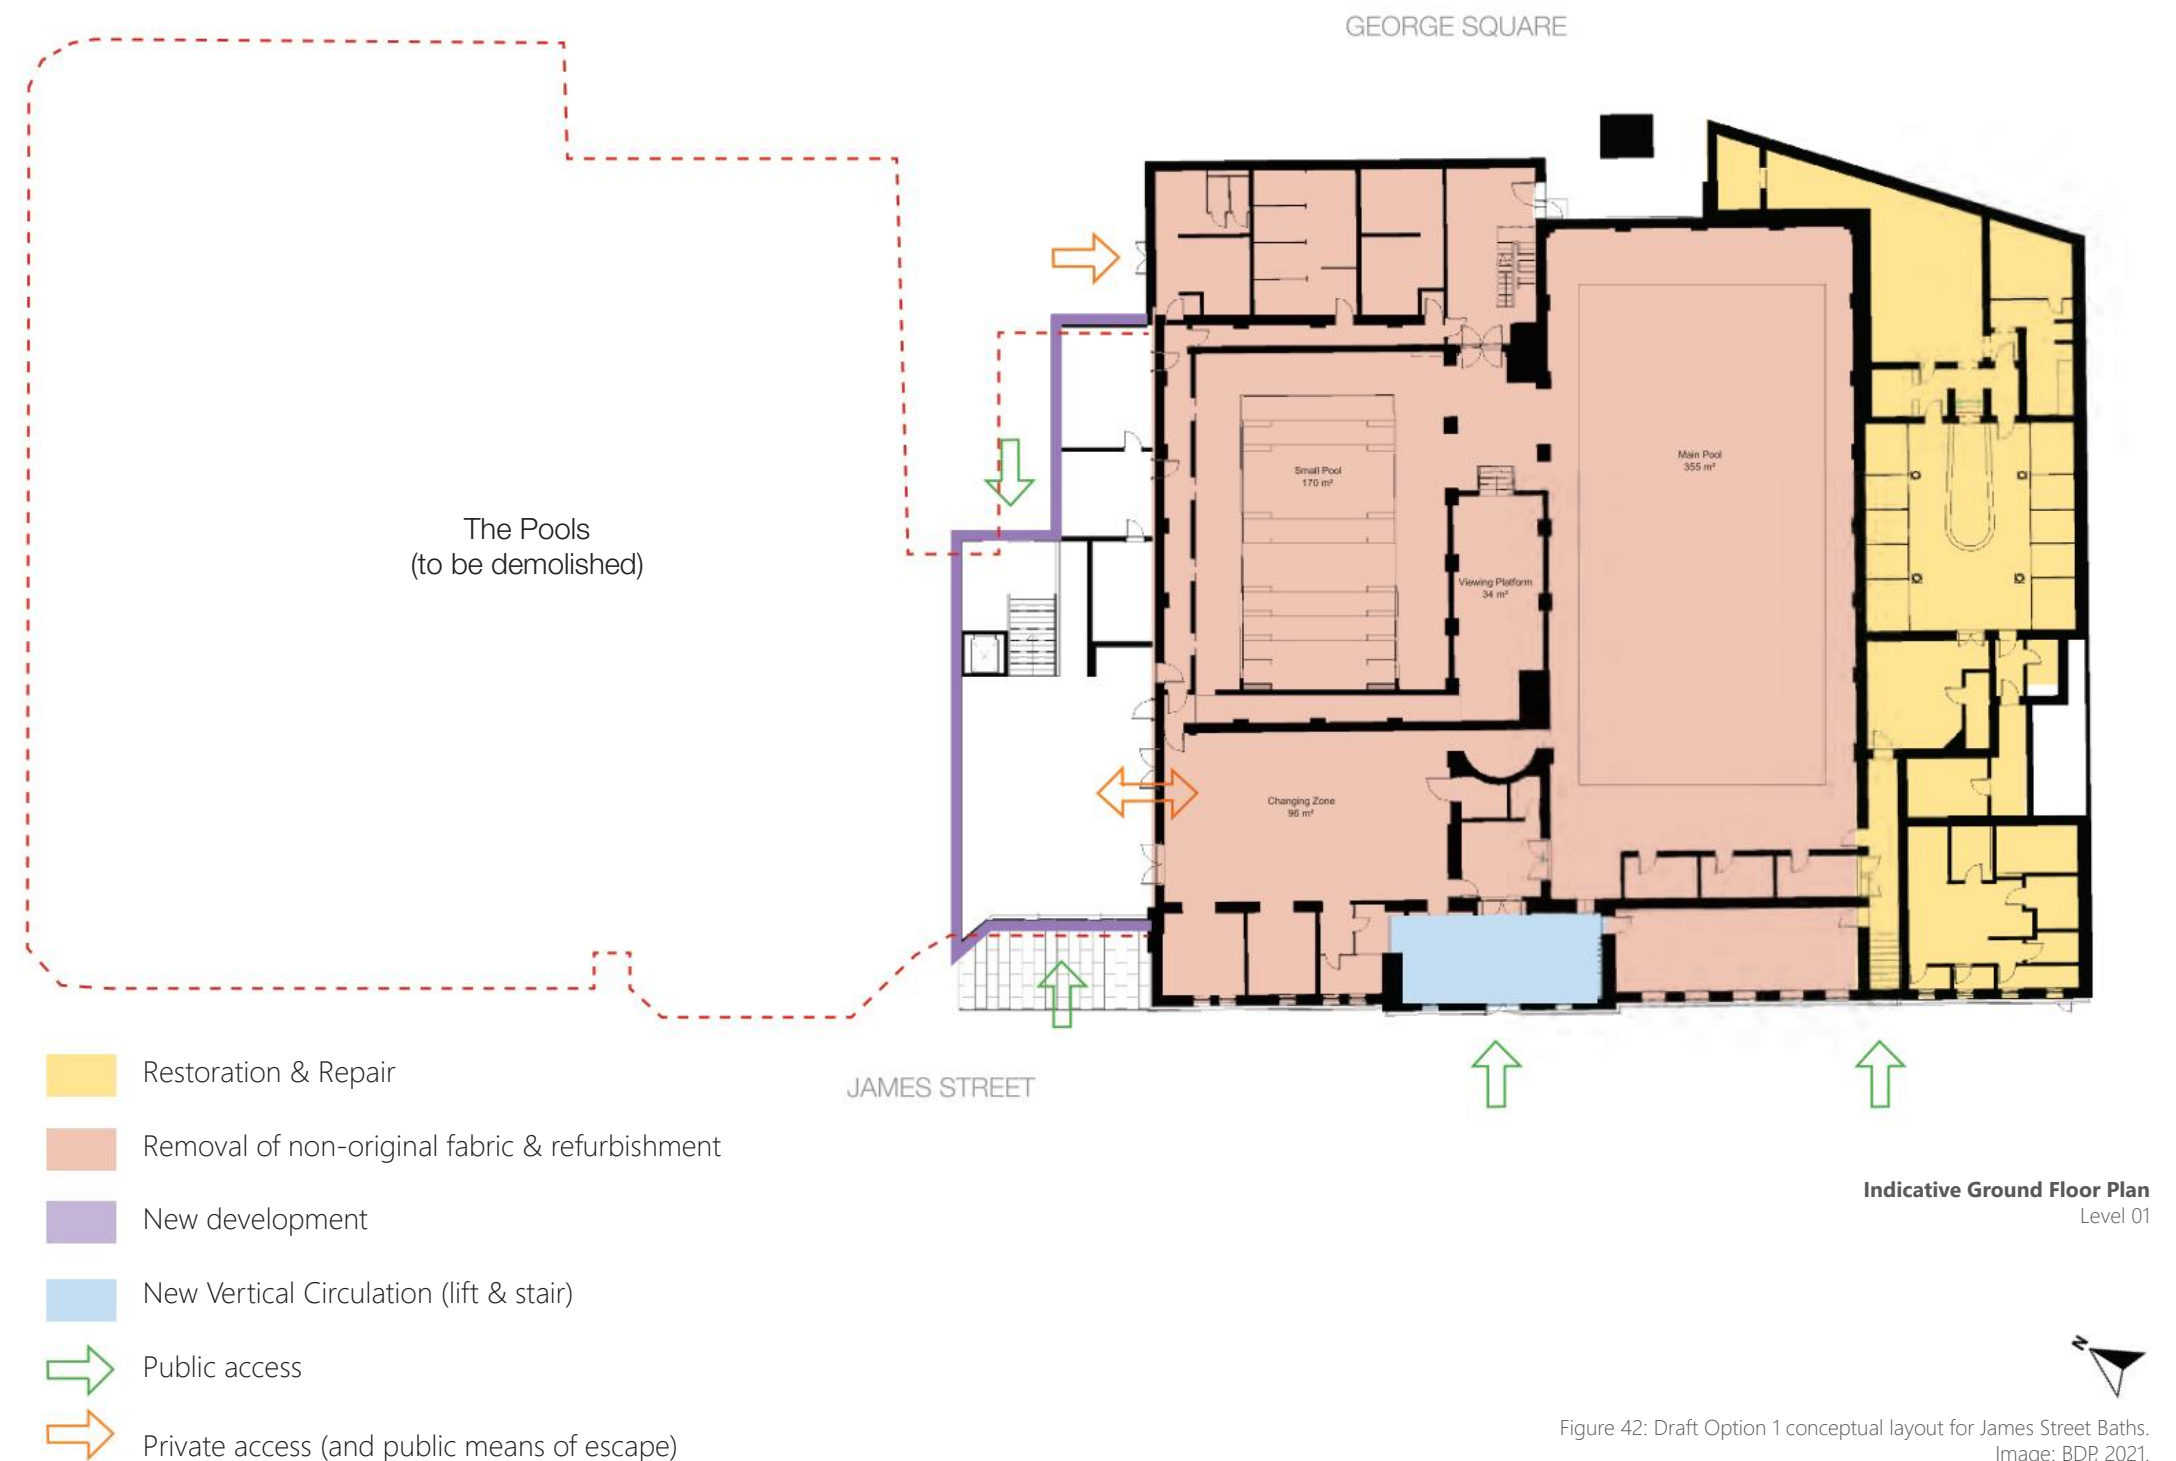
Draft Option 1 conceptual layout for James Street Baths.
